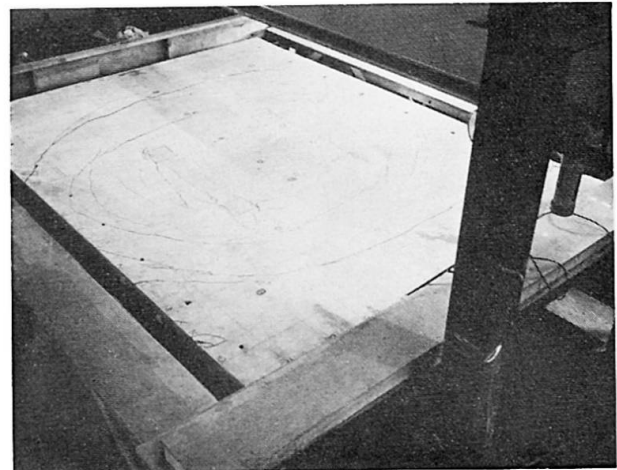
Top surface of slab 2 indicating fixed crack pattern at termination of testing.
